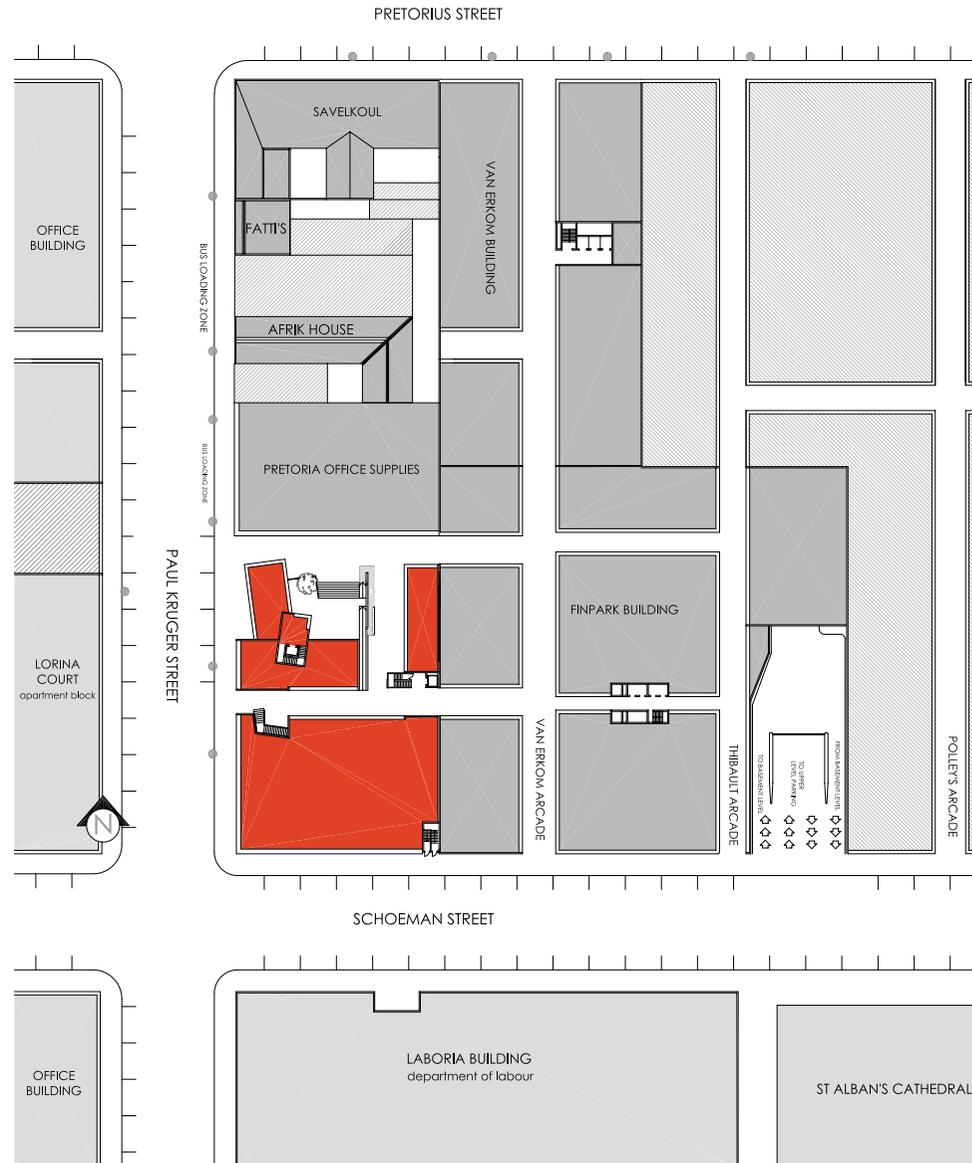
Site Layout - Proposed building footprint indicated in red
